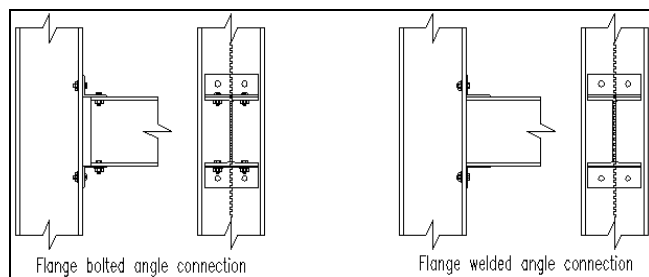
bolted and welded edge connections (Balc, 2012)
